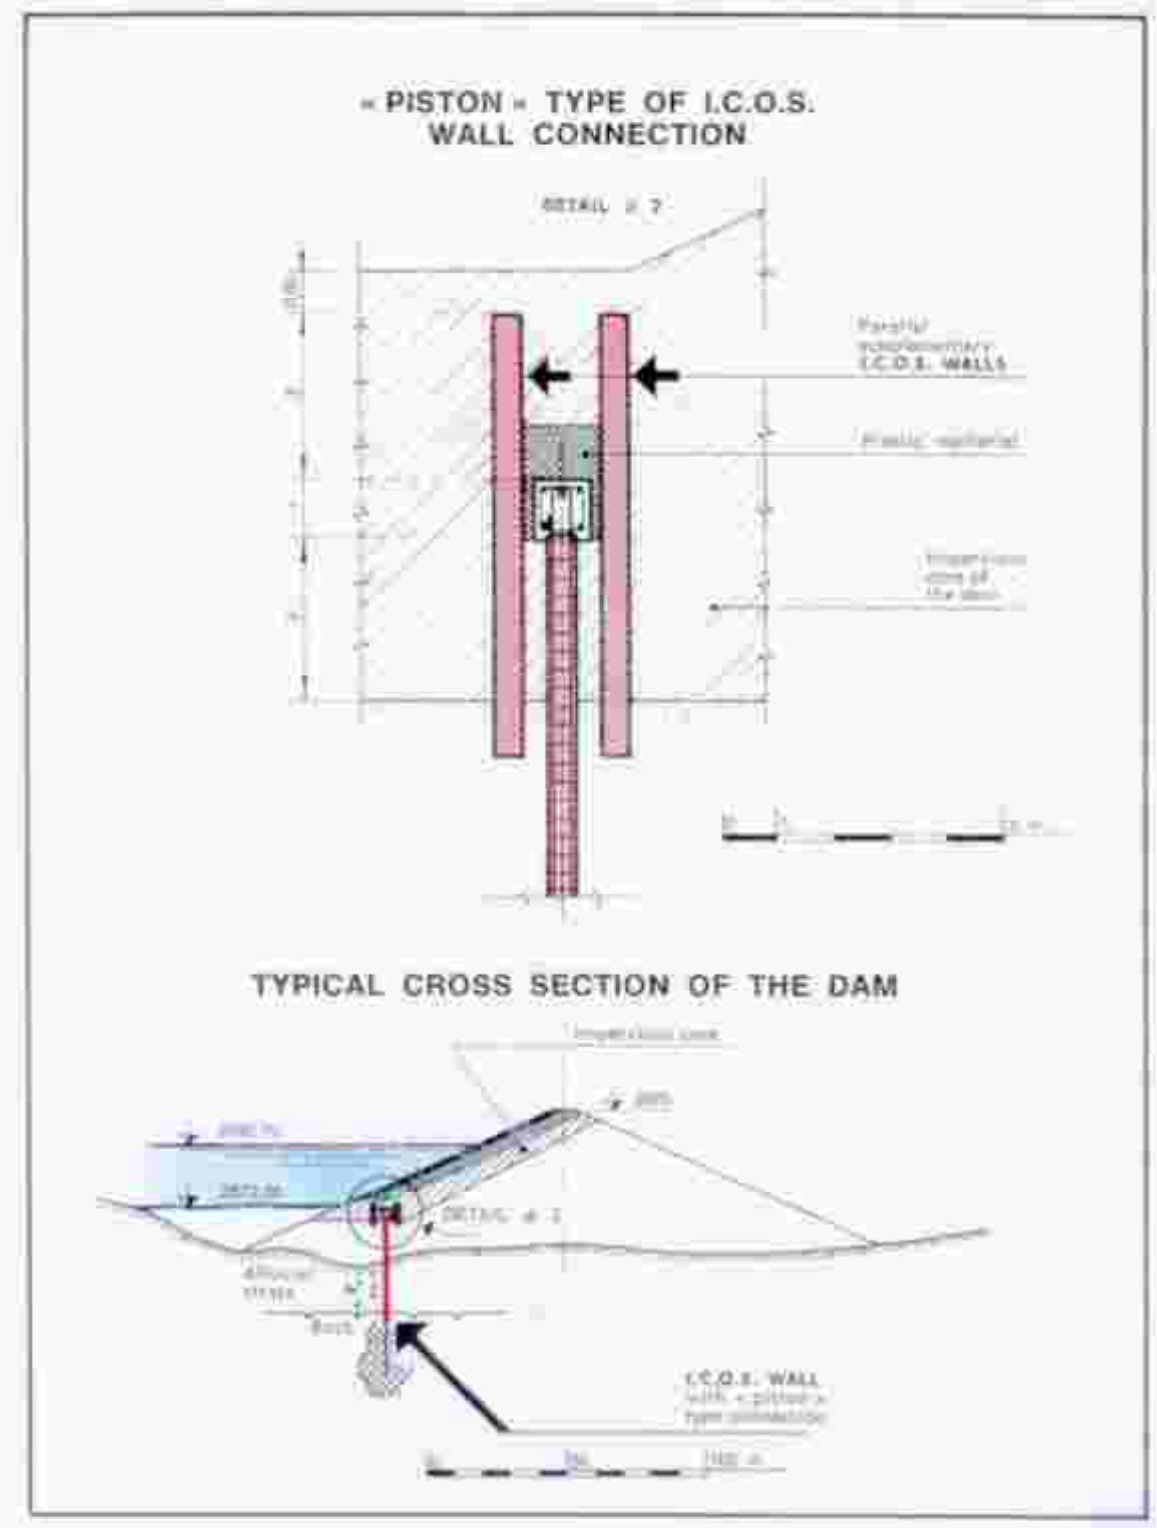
Dam on the Tominé River, Colombia: Connection between pile cutoff wall and impervious element of embankment
